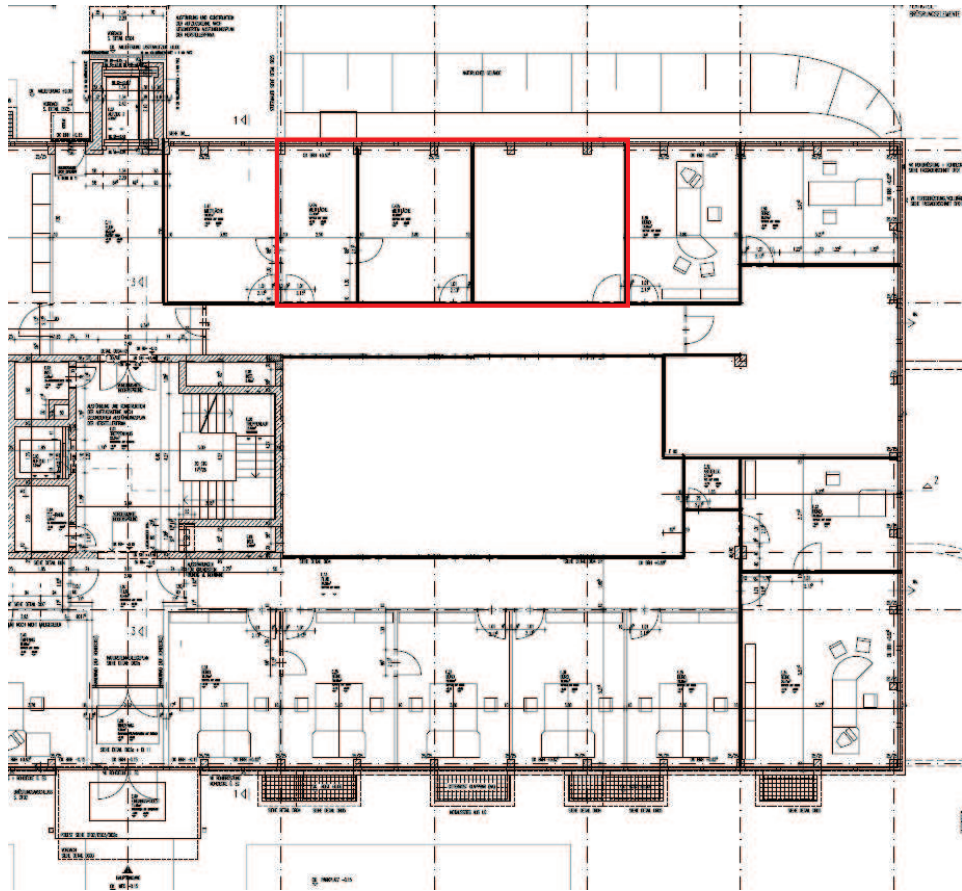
Ground floor of the DLR building. The red rectangle outlines rooms R2, R3 and R4 considered in the measurement campaign.
